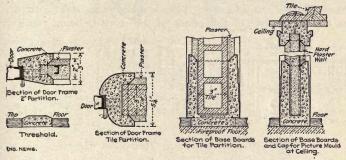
Separately Molded Details for Doors, Windows and Partitions.
